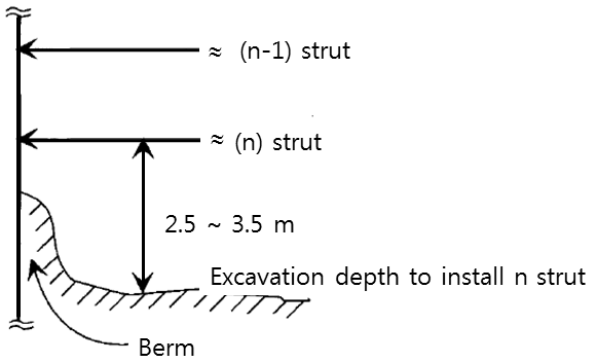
A typical bermed excavation profile at the certain stage(Yang & Park, 1999)
